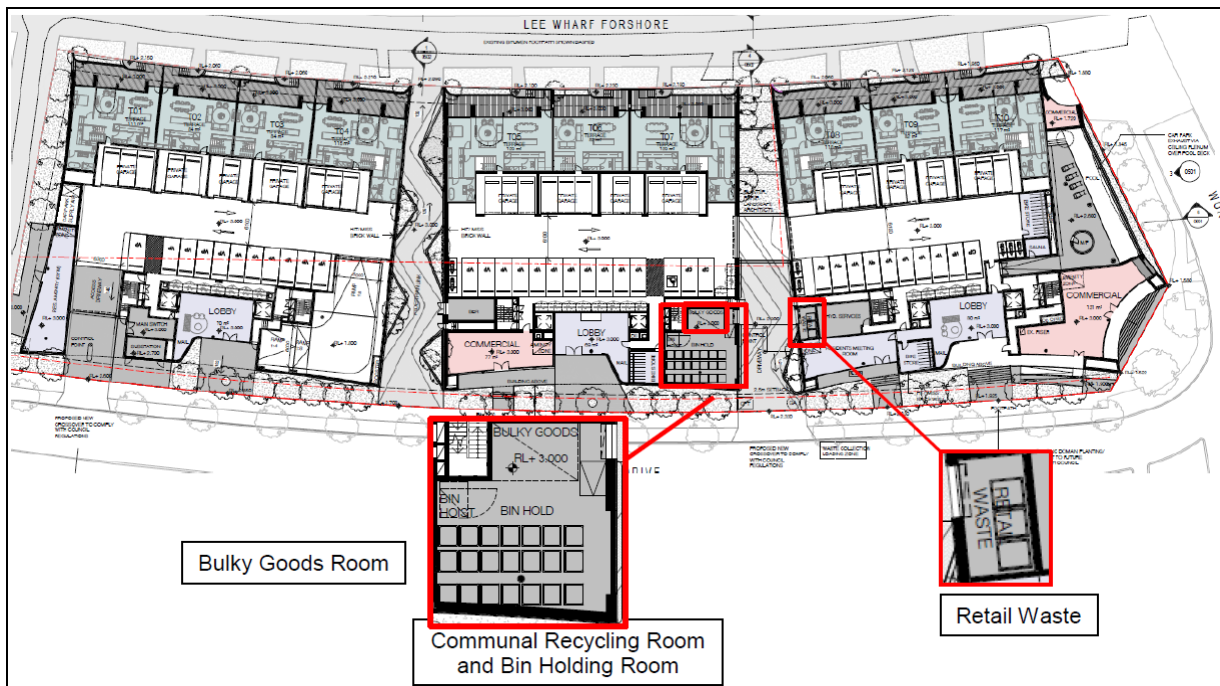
Ground floor communal waste room (outlined in red) (Source: Waste management Plan)
